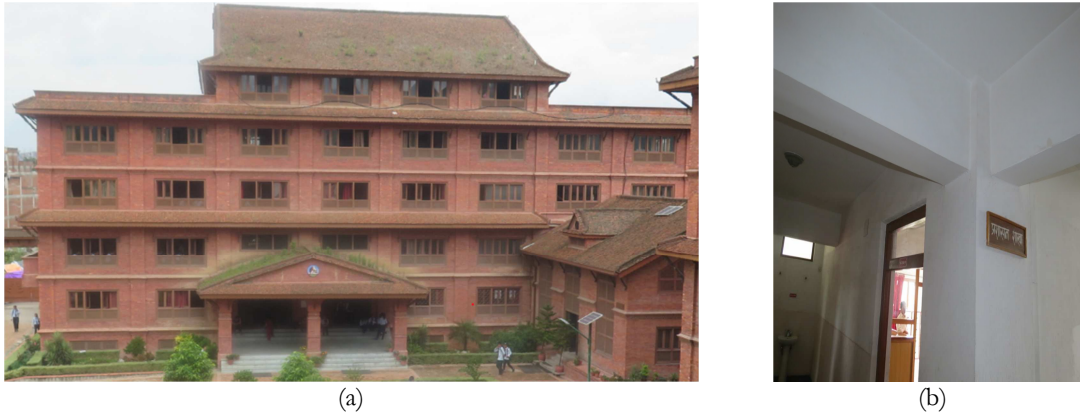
WD2 building; (a) East elevation and (b) Beam-column connection and openings in infill panels
